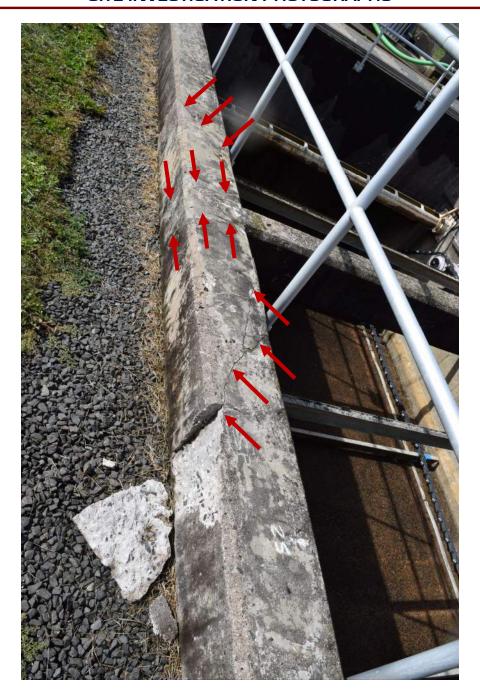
South Wall of Basin No. 2 at West Bracing Strut (Looking West)
